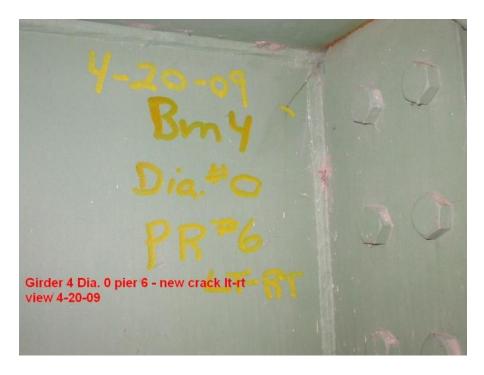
Fatigue crack on Girder 4 at Pier 6 of westbound I-80 Bridge over the Cedar River. The  $2\frac{1}{2}$  in. crack was found in April 2009.
